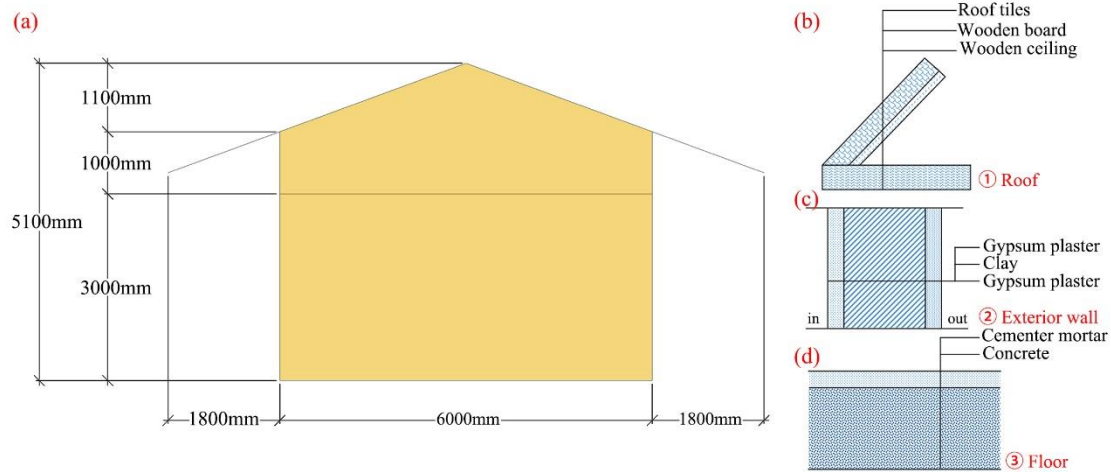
(a) Side elevation of the base model; (b) Diagram of roof construction; (c) Diagram of exterior walls construction; (d) Diagram of floor construction.
